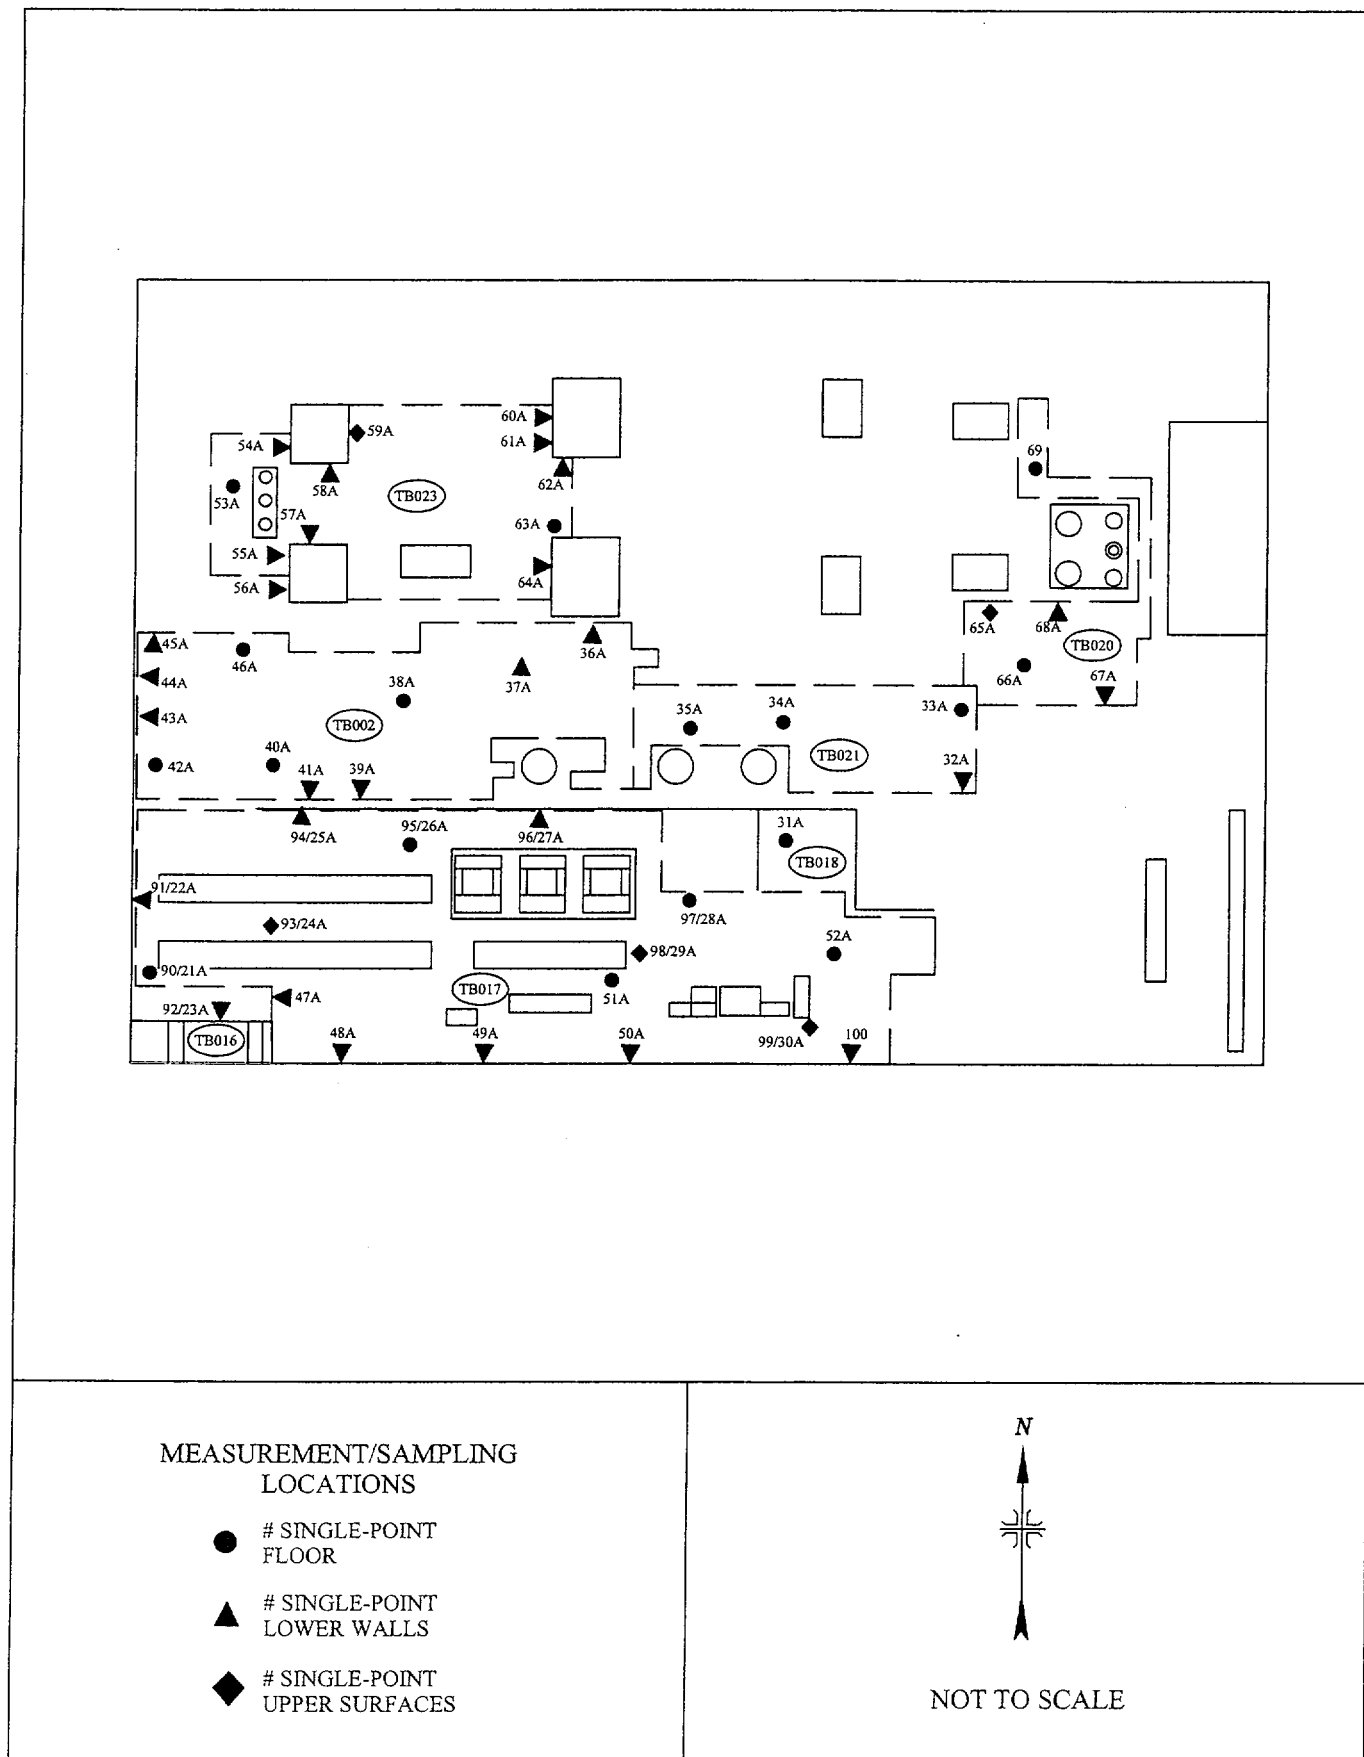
Turbine Building, Mezzanine Level - Measurement and Sampling Locations
